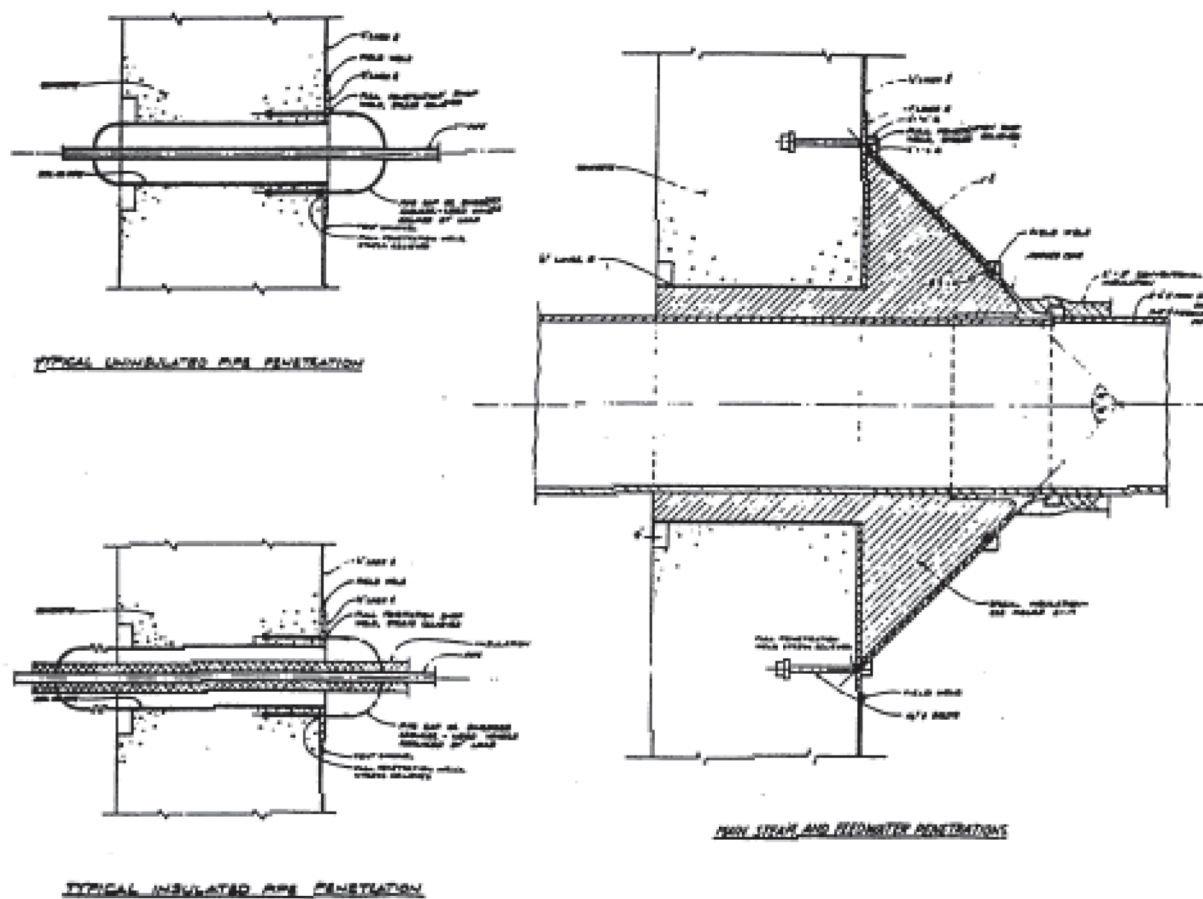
CONTAINMENT STRUCTURE - TYPICAL PIPING PENETRATIONS
